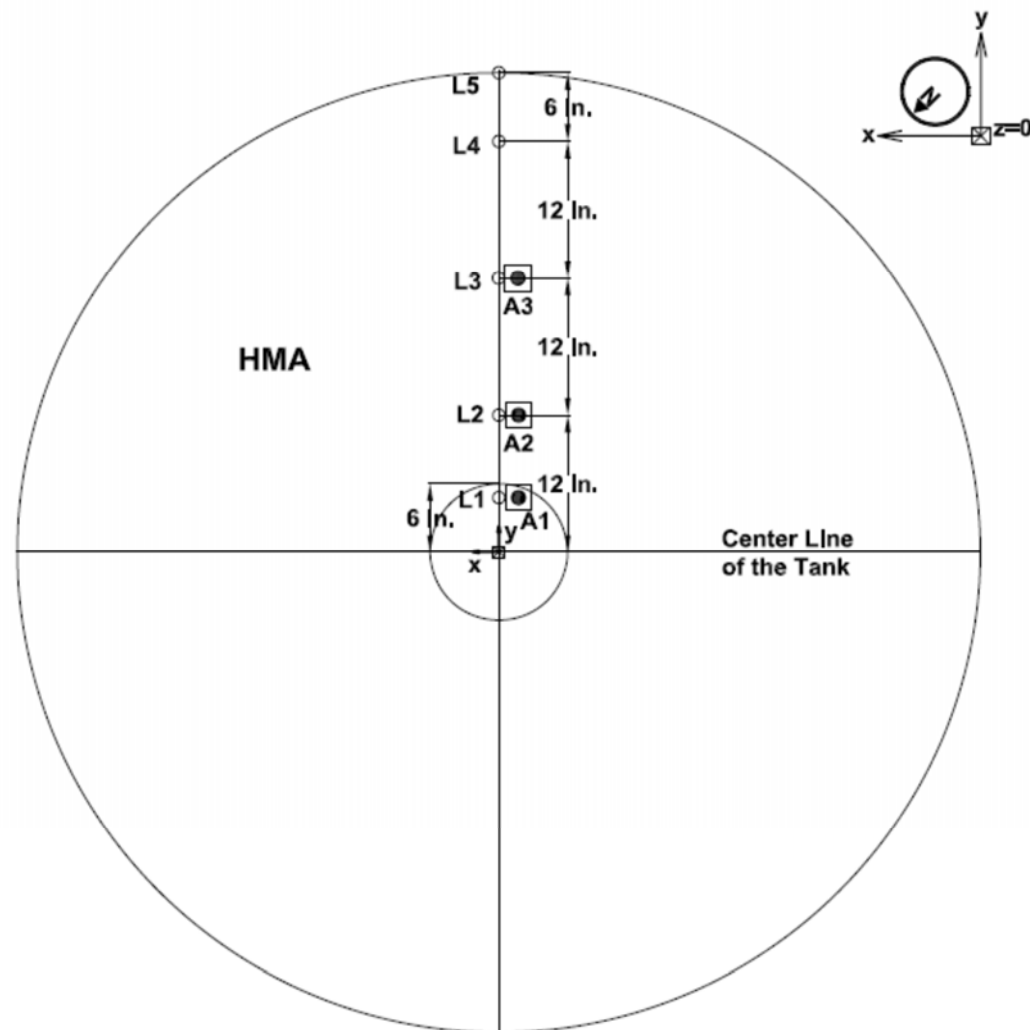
Instrumentation plan for experiment No. 3—Plan view, $Z = 0$ inch
